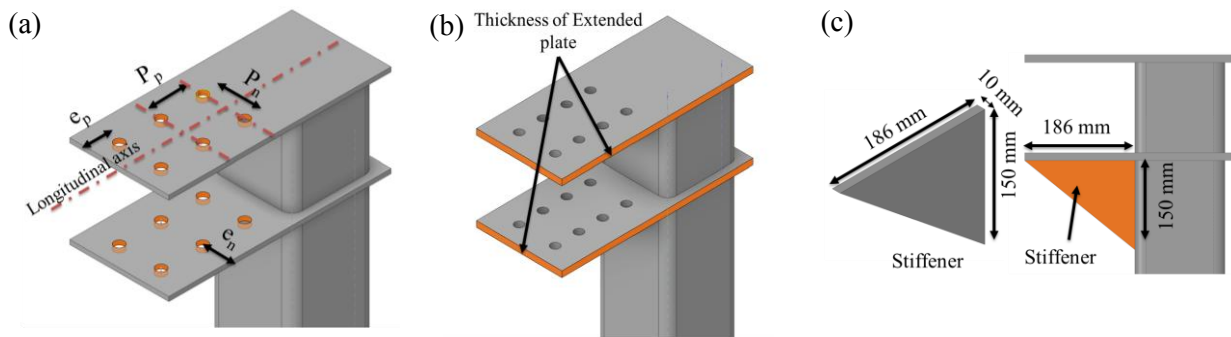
Details of the main studied geometric parameters: (a) bolt arrangement pattern, (b) extended plate thickness, (c) stiffener at the lower extended plate
